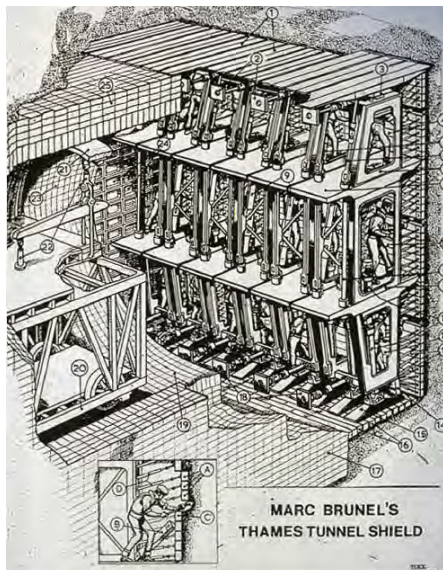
The first ever tunnel shield (photo sourced from www.tunnelsonline.info).
